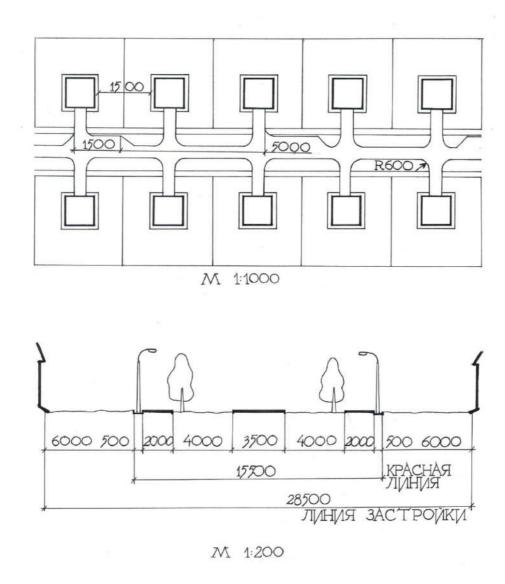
One-lane driveway. Example of a driveway cross-section development
